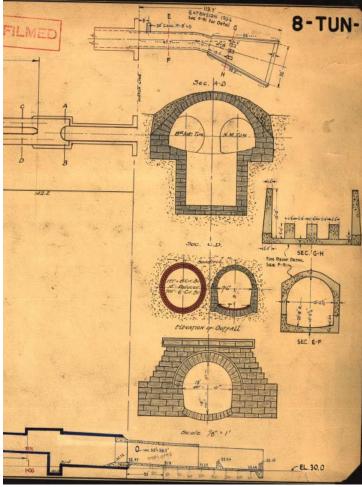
Central City Tunnel System Outfall Cross-Section
